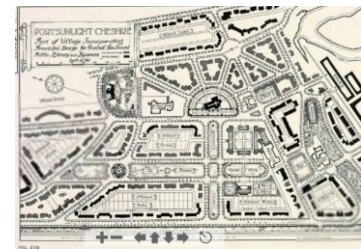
Figure LVII: Maisons d'ouvriers de Port Sunlight, Lever's plan for Port Sunlight, 1889.
